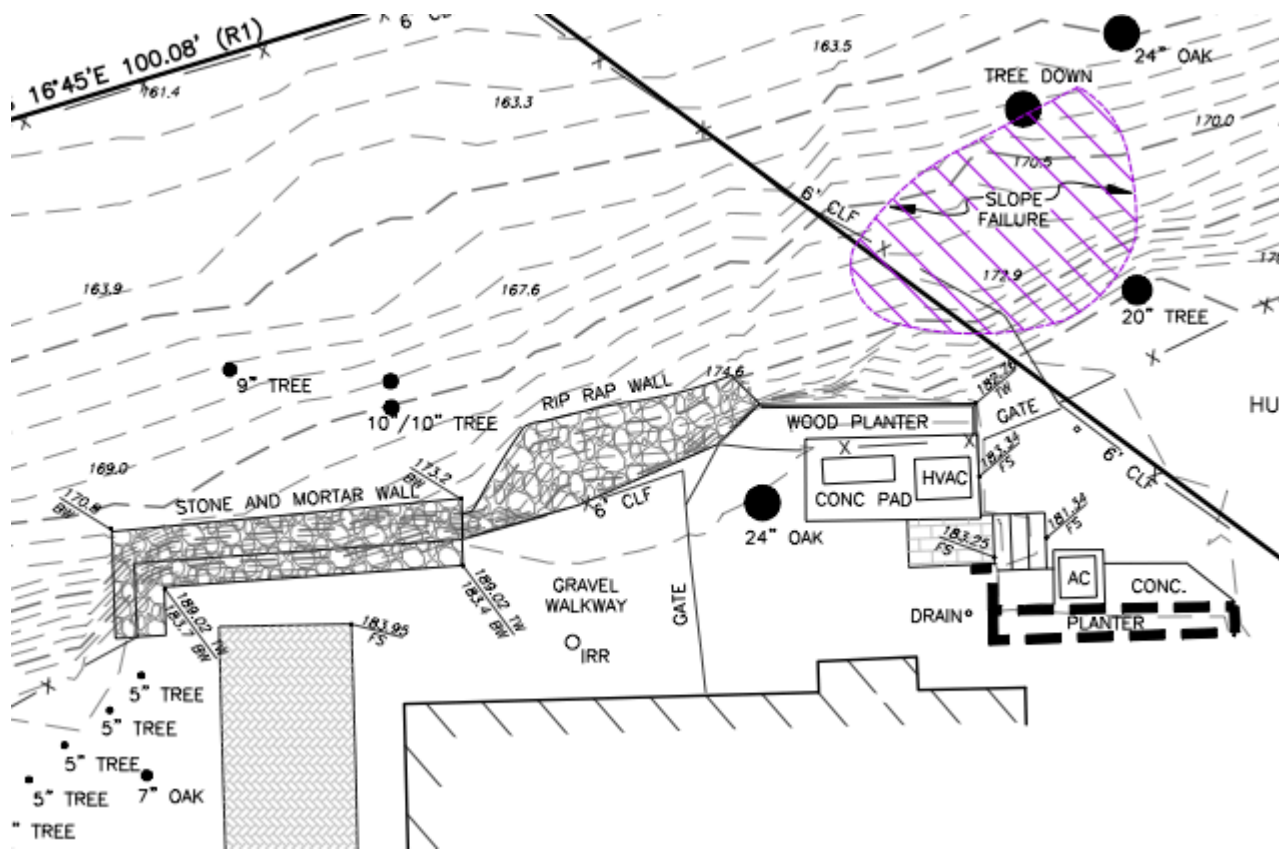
Showing Location of January 9, 2023 Slope Failure, Stone and Mortar Wall, 24” Oak, HVAC System, and East Side of Residence Located Immediately Adjacent to the South End of the Slope.
